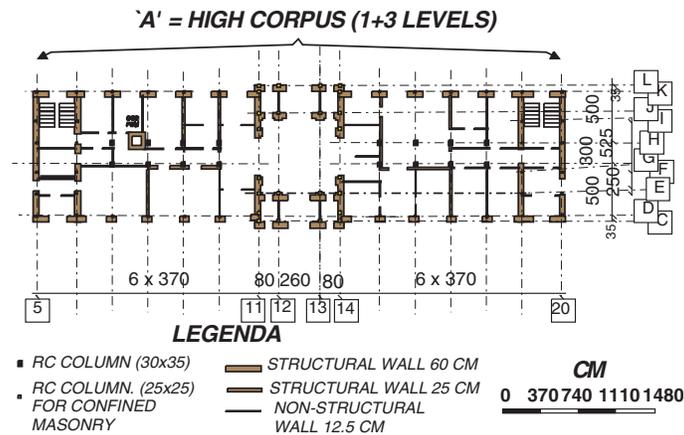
NIRS. The 3<sup>rd</sup> main floor plan
